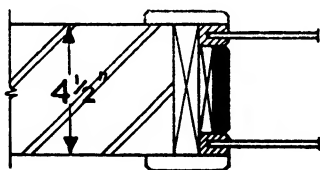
DOUBLE WINDOW CONSTRUCTION WITH $4\frac{1}{2}$ IN. WALL
